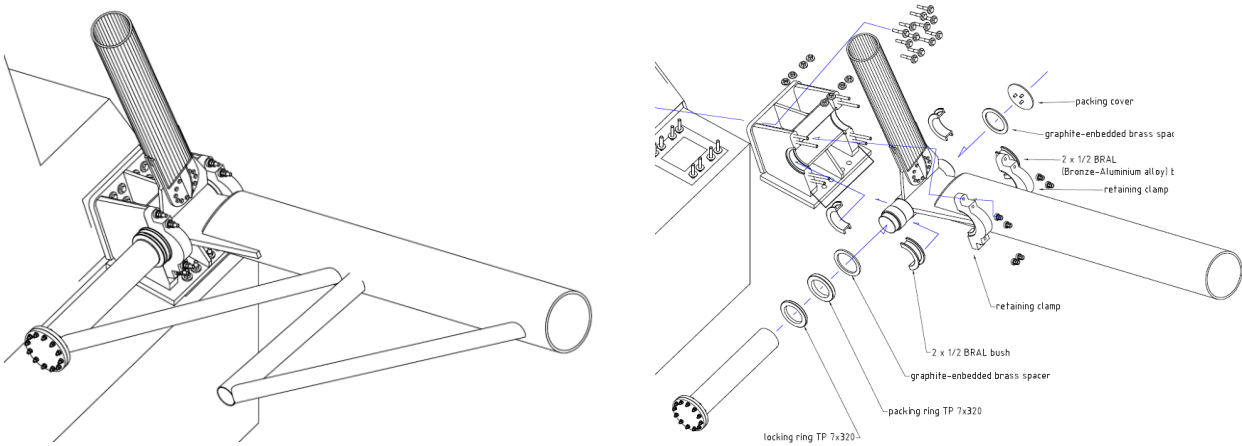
3D and exploded views of the hinge connecting the lower chord of the arches to the piers
